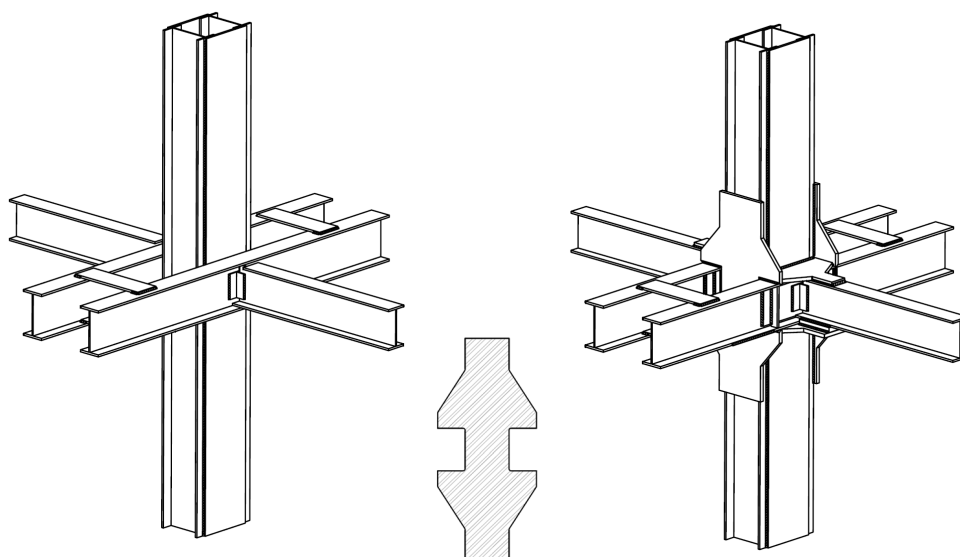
Typical existing Khorjini connection before upgrading (Left), proposed vertical plate (R-plate) to be added to both sides of the connection (Middle), and the upgraded Khorjini connection (Right)
